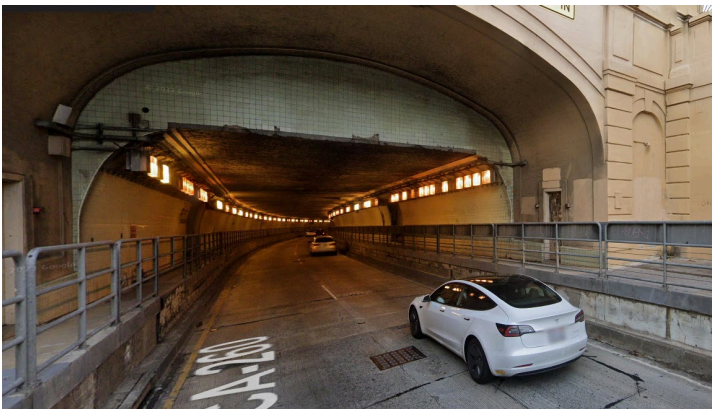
Raised walkways for pedestrians, Posey tunnel, Oakland CA
